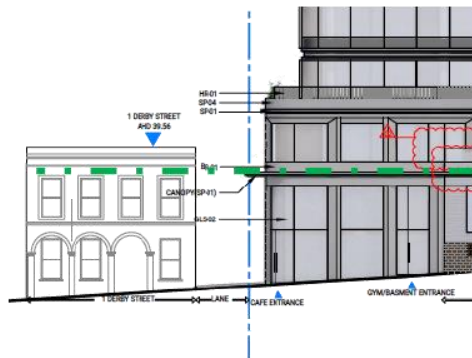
Excerpt from North Elevation (drawing A0901) highlighting alignment of expressed canopy line relative to neighbouring building (above that building's windows, close to the cornice line).
